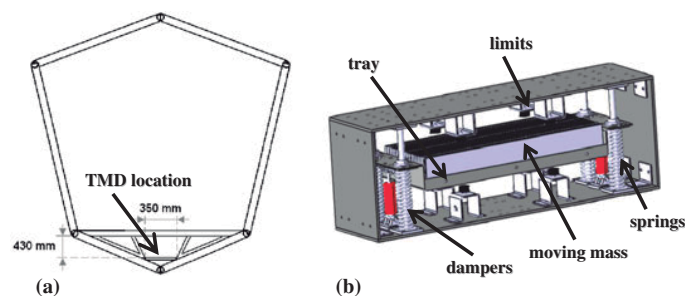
(a) Footbridge cross section and TMD location under the timber walkway. (b) CAD model of the TMD.
